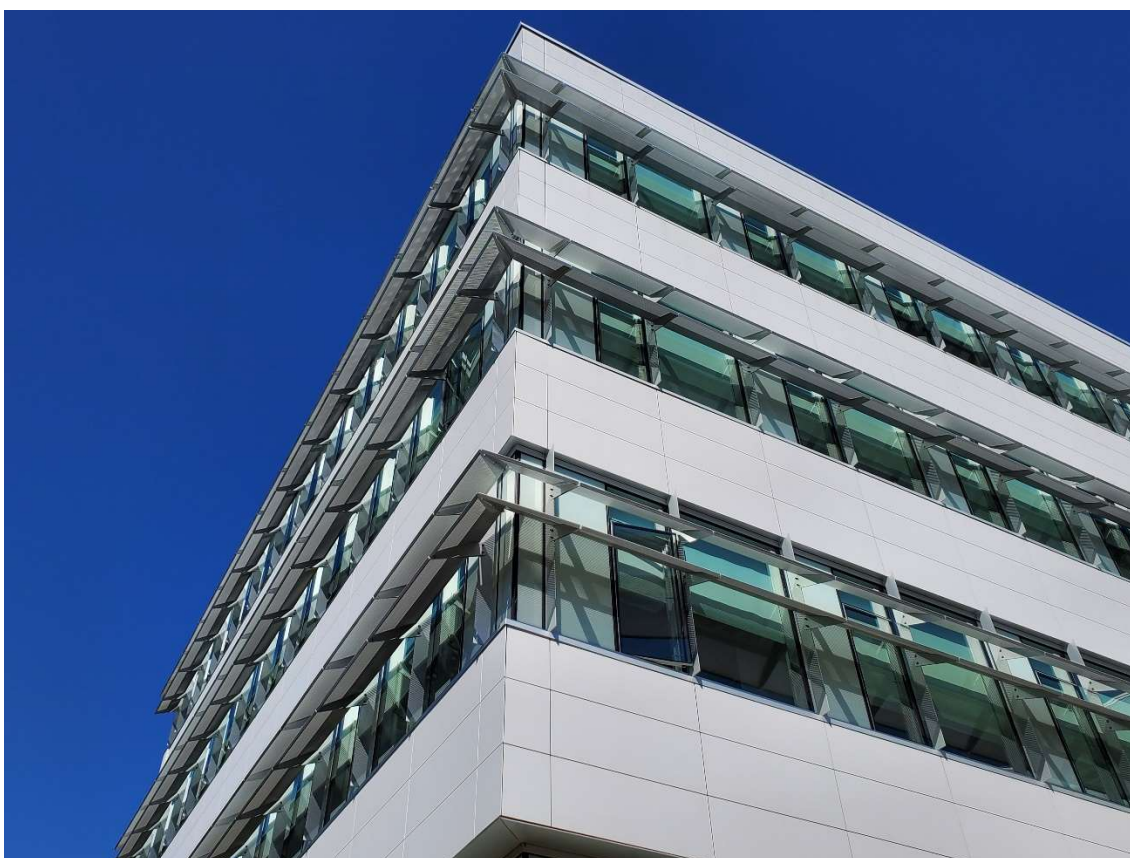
Horizontal External Shading Installed at UBC Earth Sciences Building
